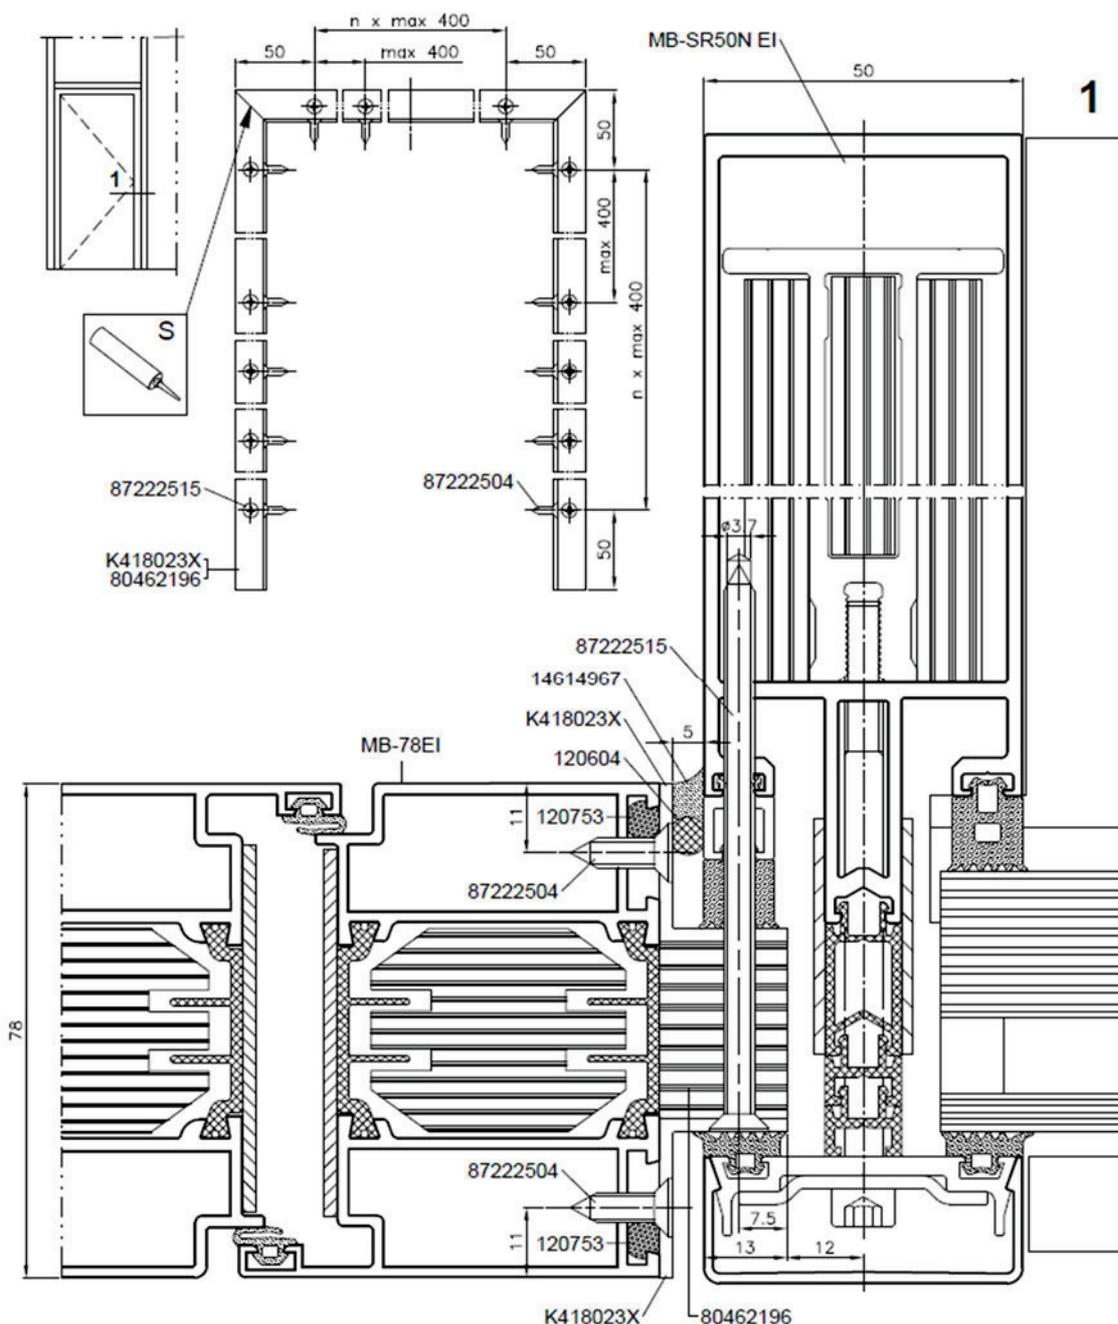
Installation of door frame in ALUPROF MB-SR50N EI filling type curtain wall
